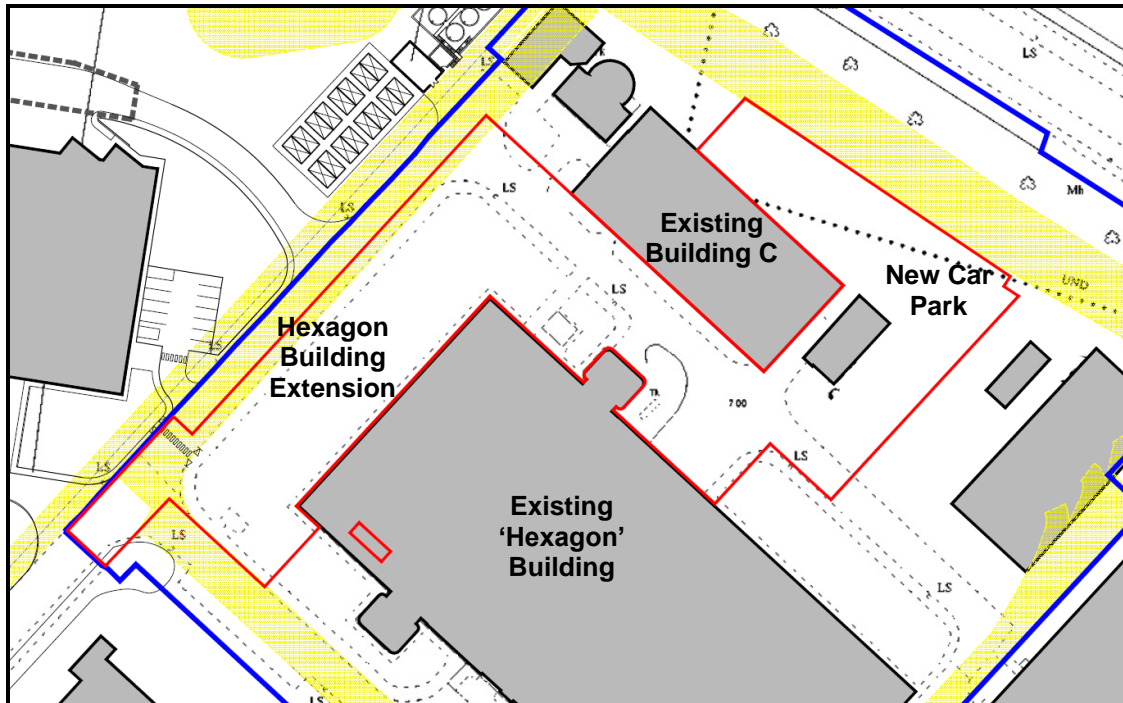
Proposed Site Layout Plan (Source: MCA Architects, December 2017)
